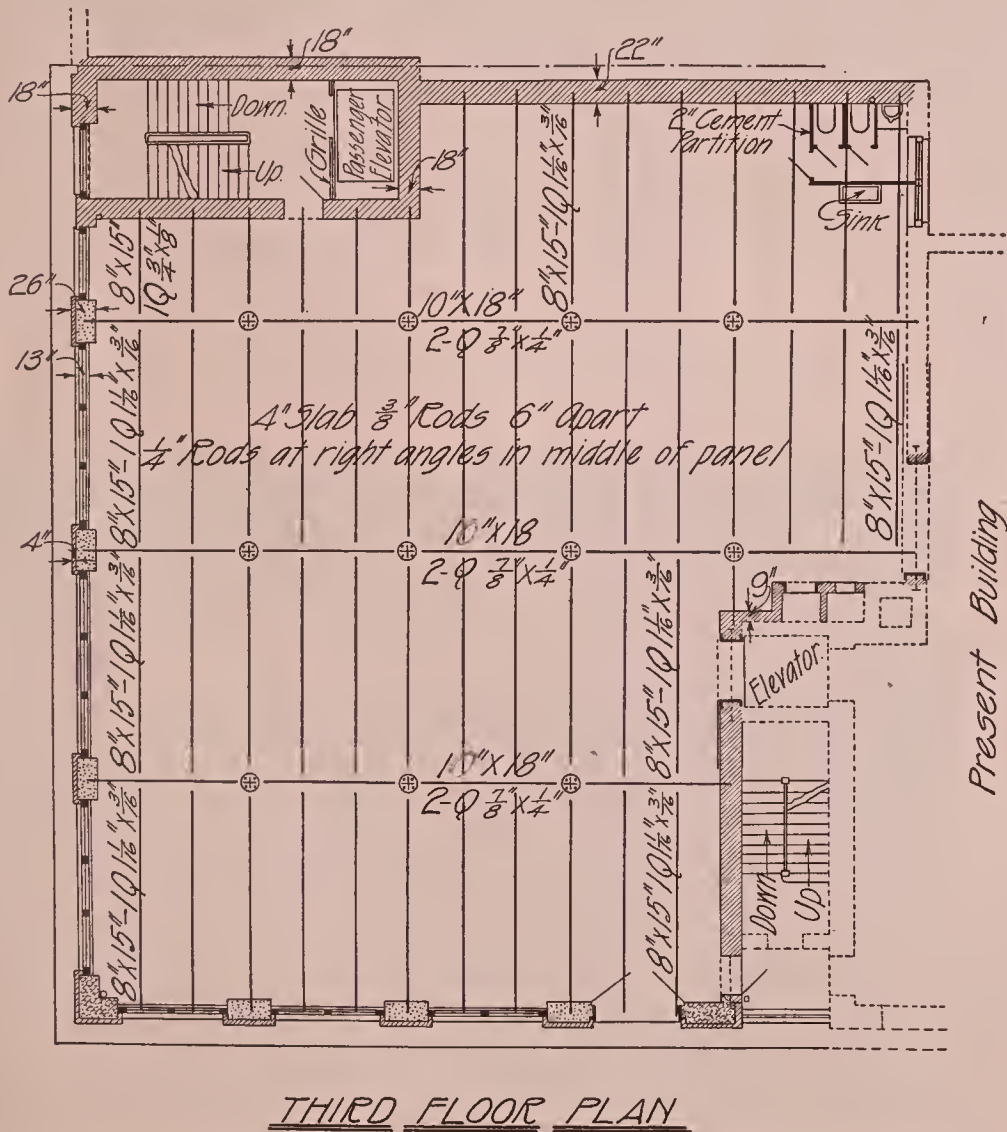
Typical Floor and Roof Plans of the Ketterlinus Building.
